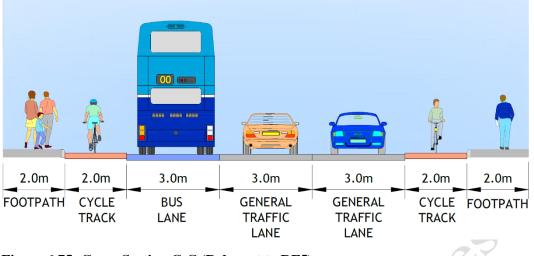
Cross-Section C-C (Relevant to RF5)
